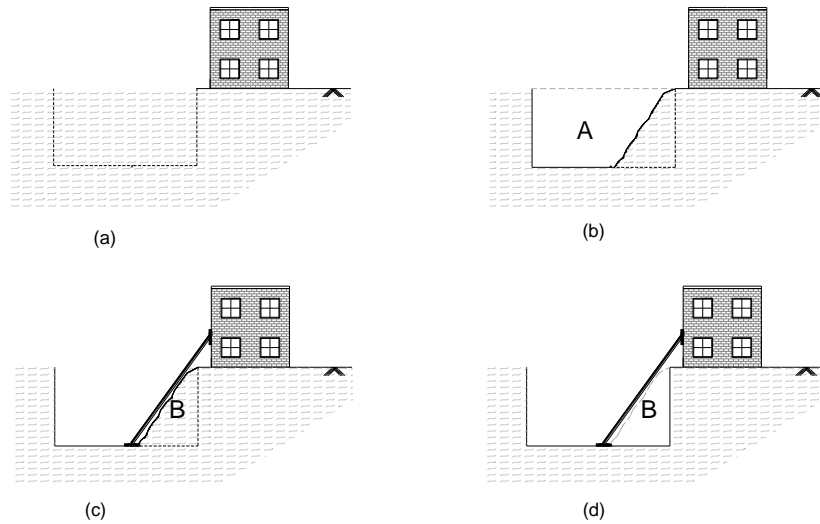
Traditional excavation procedure (a) before excavation, (b) excavation zone A (stage 1), (c) installation of strut (stage 2), (d) excavation zone B (stage 3)
